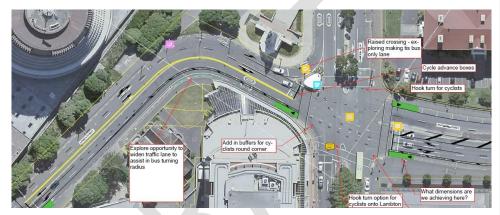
Excerpt from plan - Bowen Street / Lambton Quay intersection (C17)
